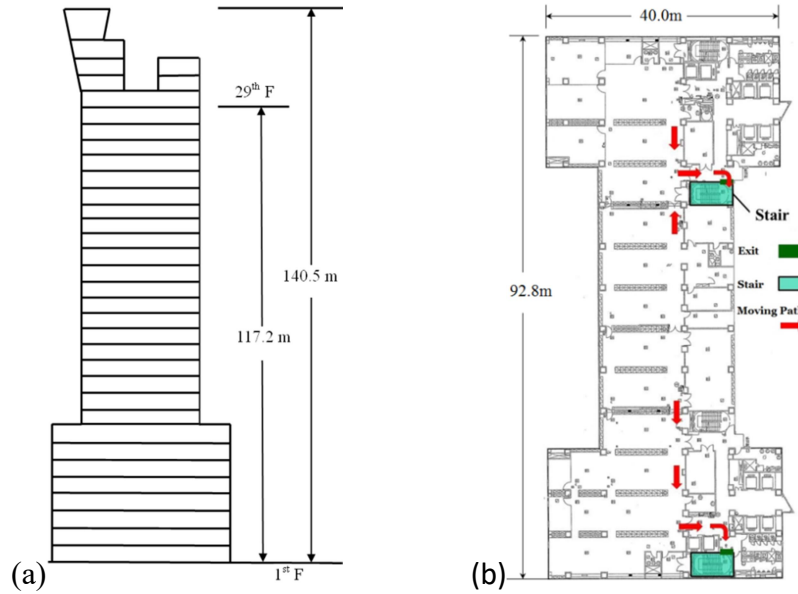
The schematic view of New Taipei City Hall (a); typical floor layout of evacuation strategy (b).
